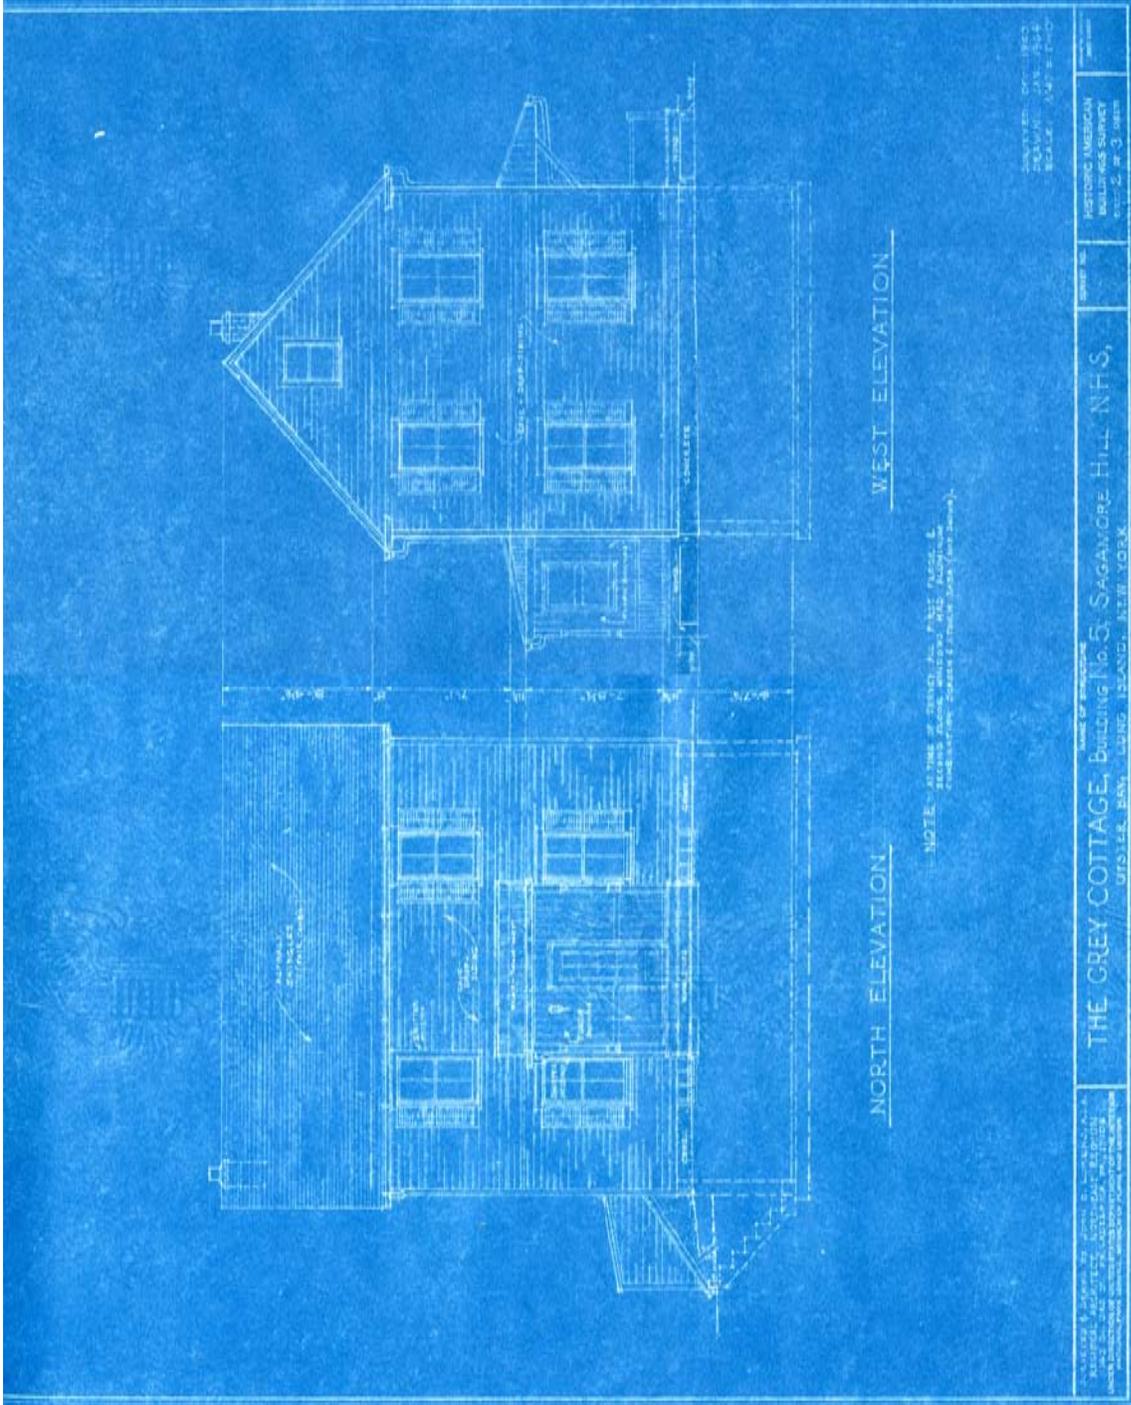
The Grey Cottage, Building No. 5, Sagamore Hill NHS, Historic American Buildings Survey, Sheet 2 of 3 sheets. Reproduced from full-size blueprint; not to scale.
